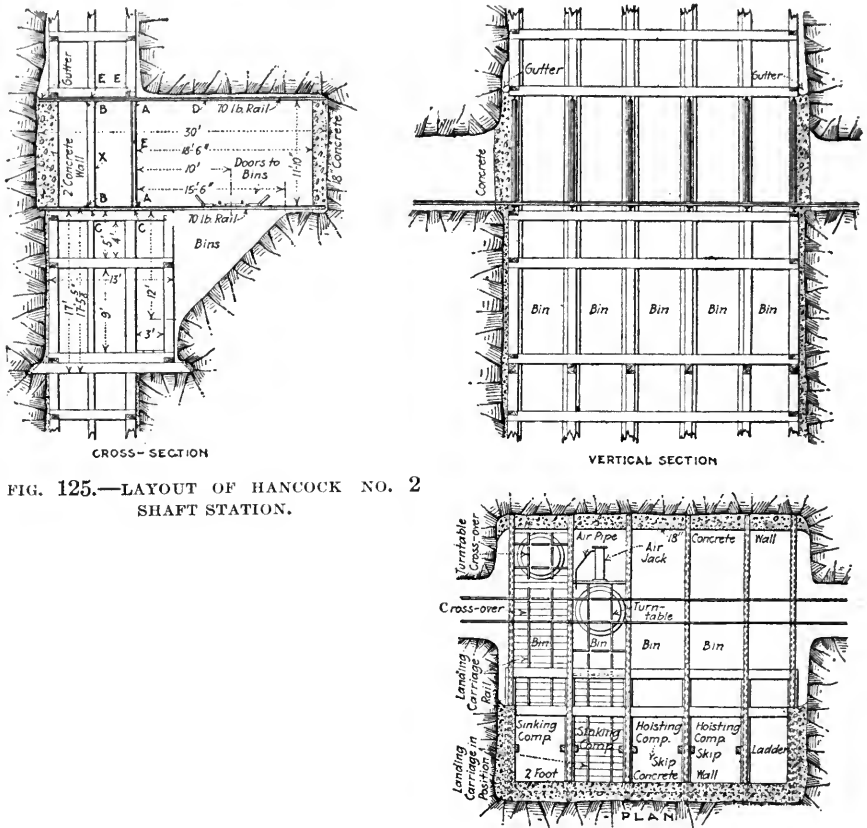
LAYOUT OF HANCOCK NO. 2 SHAFT STATION.
